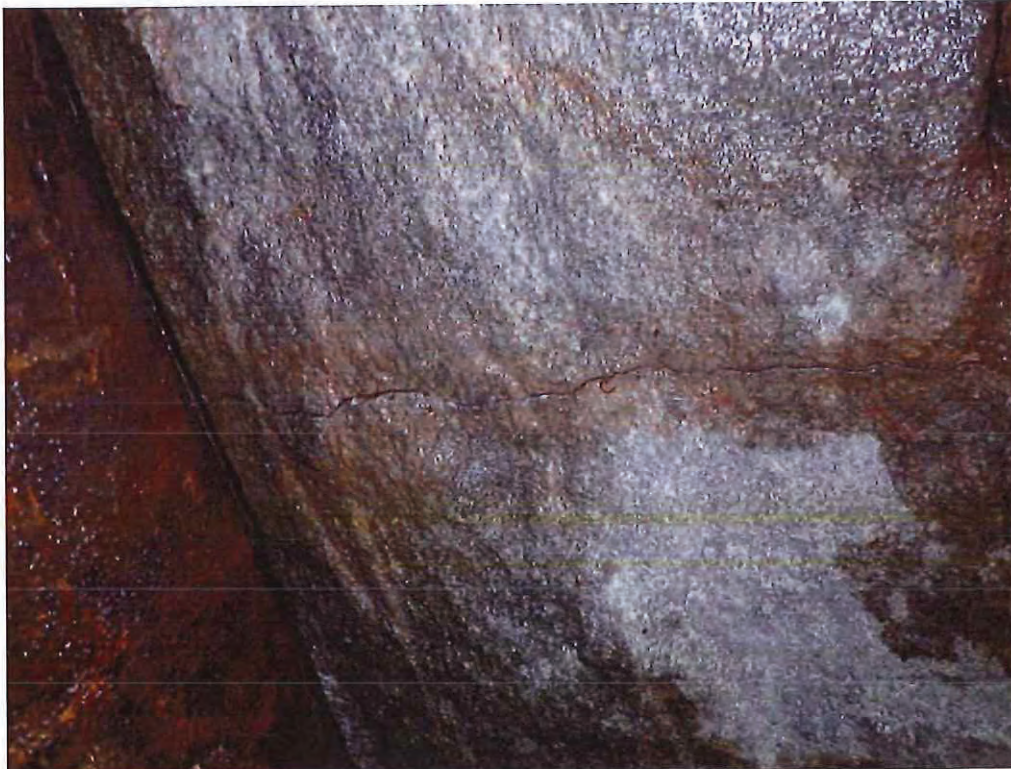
Second concrete slab from the east: spall at the southwest corner measuring 2' wide x up to 3' long
